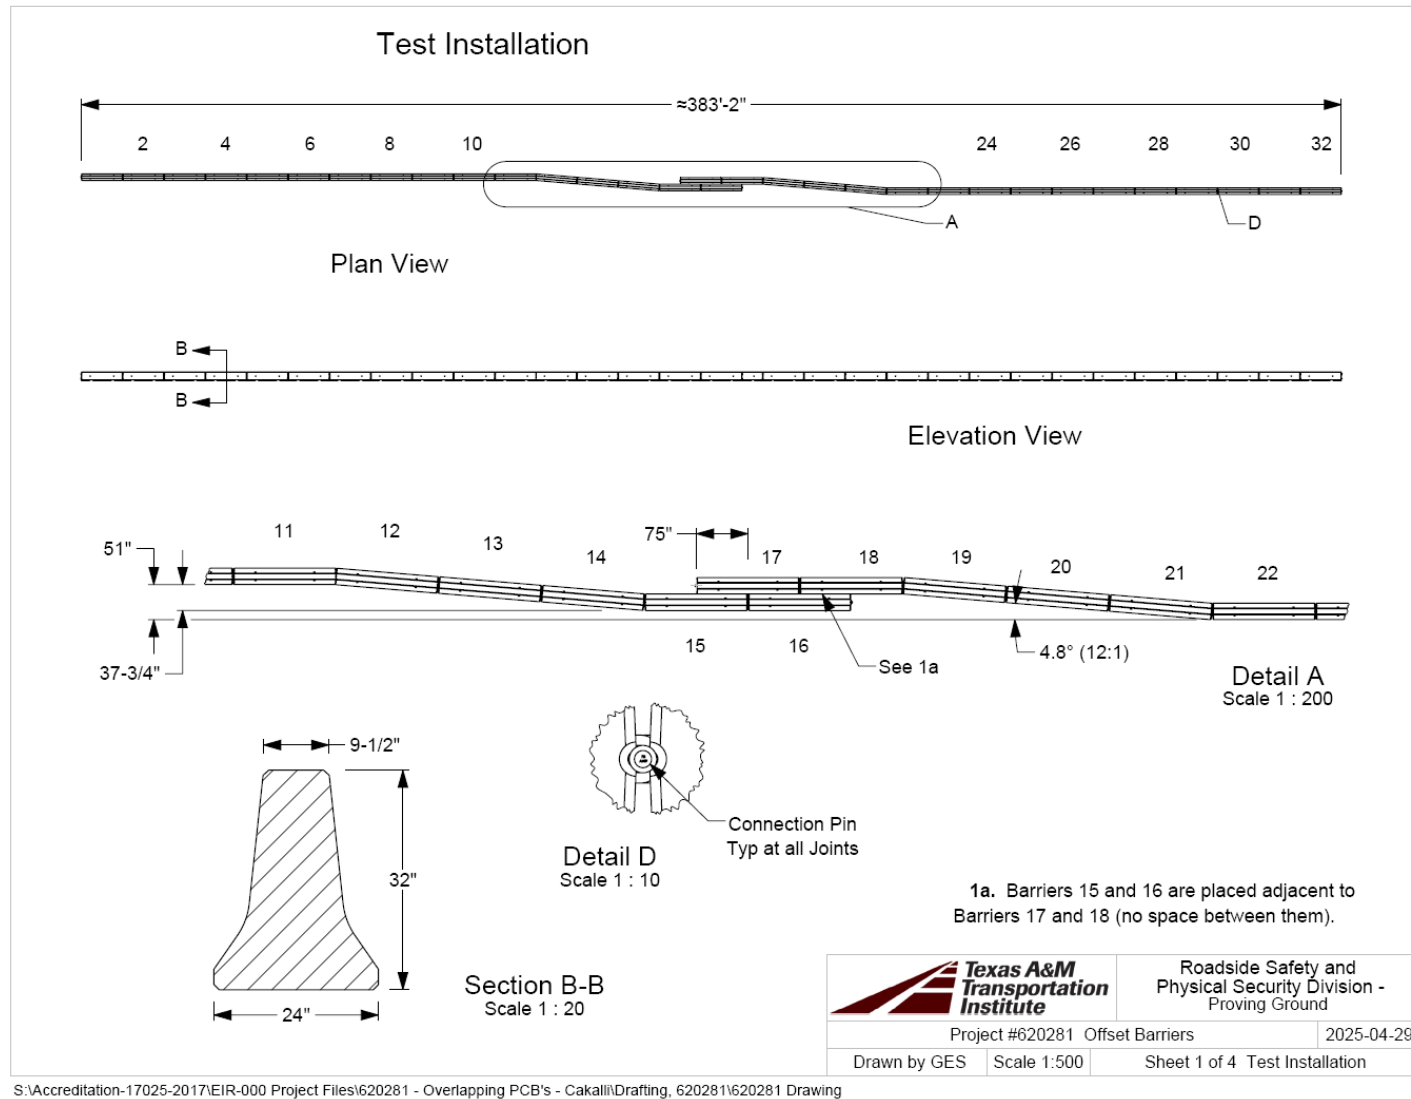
Details of Overlapping Precast Portable Concrete Barriers.
